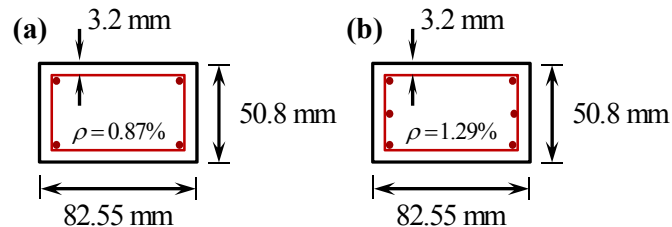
Cross-sectional dimensions and reinforcement detailing of small scale columns [with a scale factor of 1/8], (a) configuration 1, (b) configuration 2 (ρ denotes reinforcement ratio)
